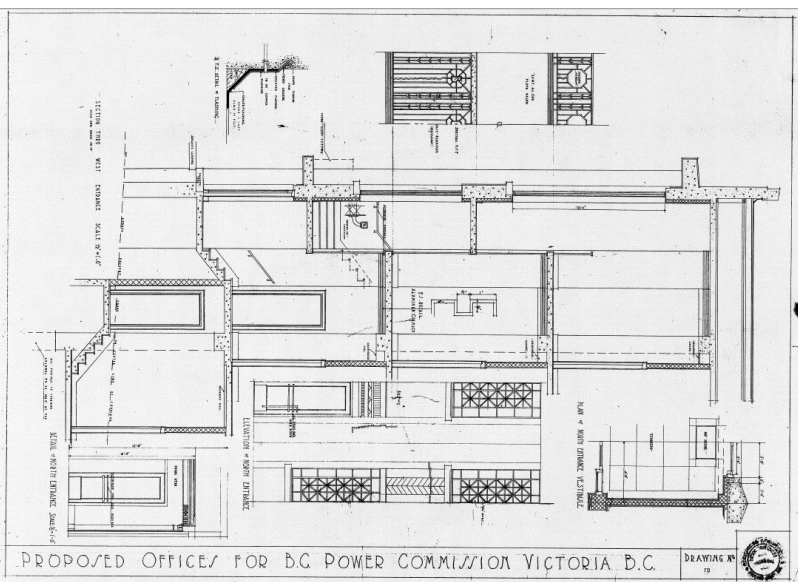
Section Thru West Entrance / Elevation of North Entrance
